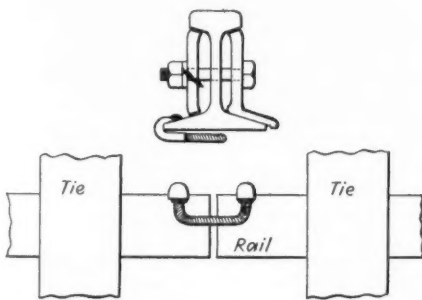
Short Bond Installed on Splice-Bar Side of Rail. Lower Figure Shows the Bottom View.
